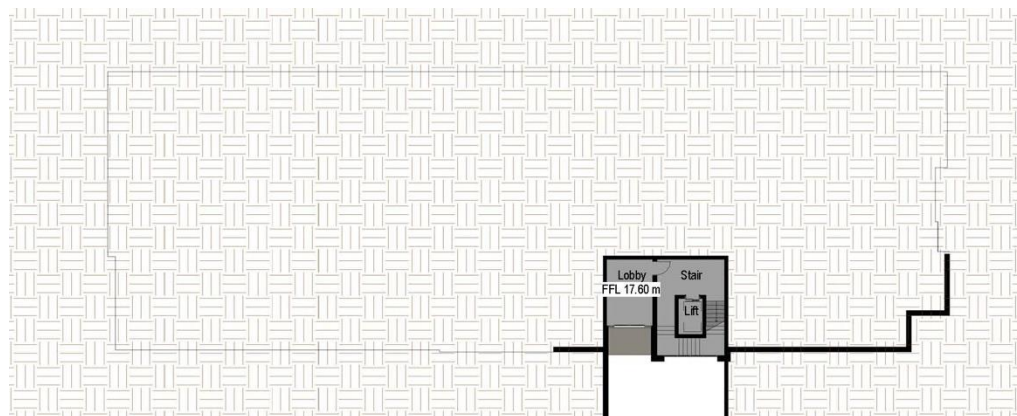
The Level 0 (Entry) floor plan of Building B04 (Ryman Drawing A1-010 RC22).
